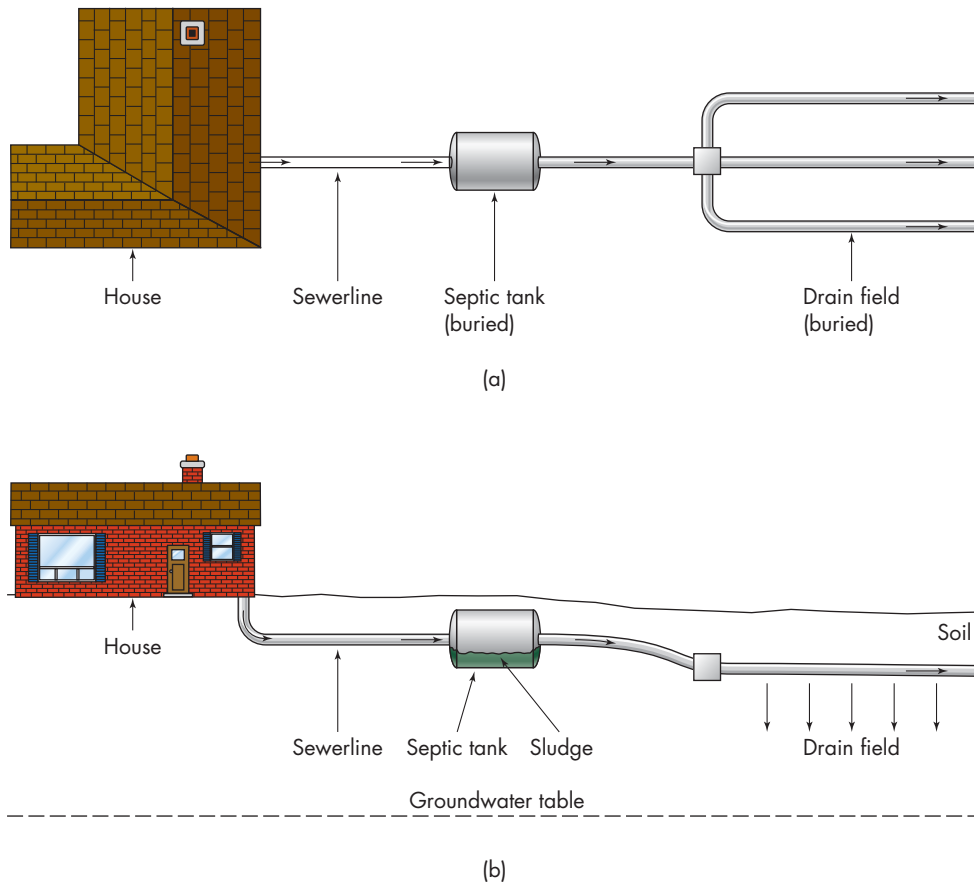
Septic tank Sewage disposal system for a home. (a) Plan (map) view. (b) Cross section.
